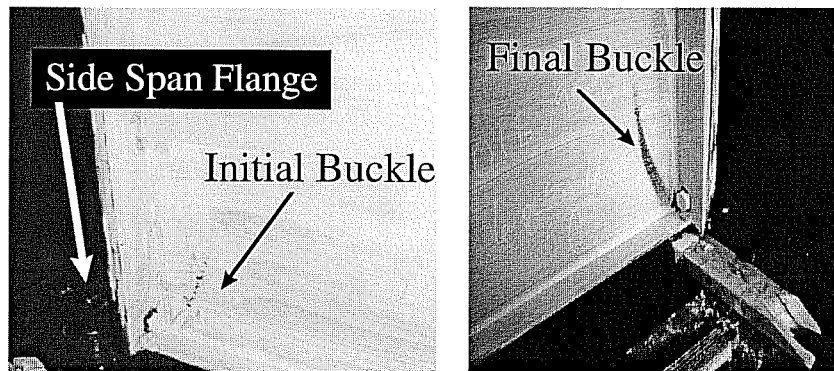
Web Cripple of 30 in. Girder At End Plate Connection
